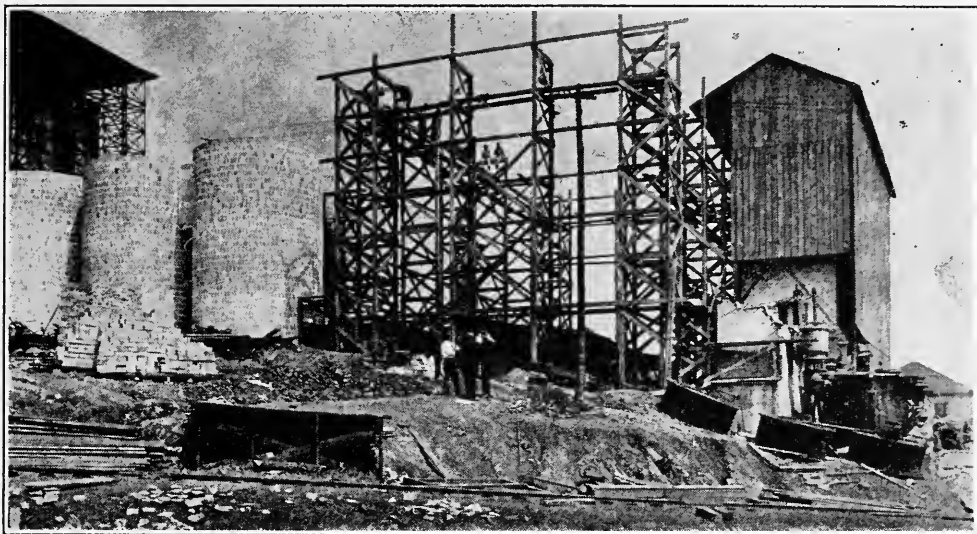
Silicate Cement in Acid-Proof Construction.
